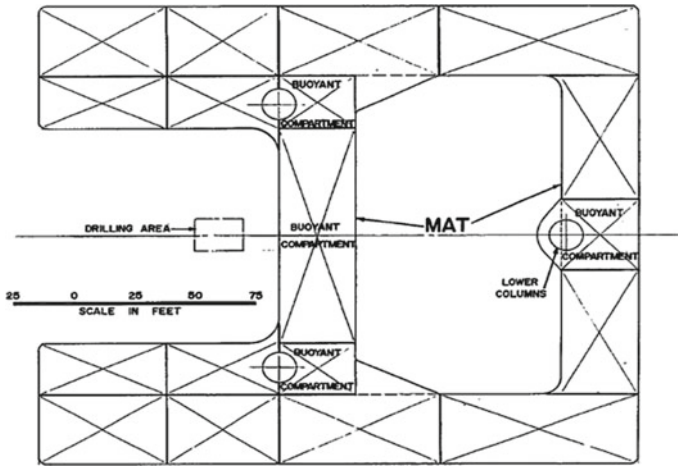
Mat foundation for jack up in plan for Scales [1]
